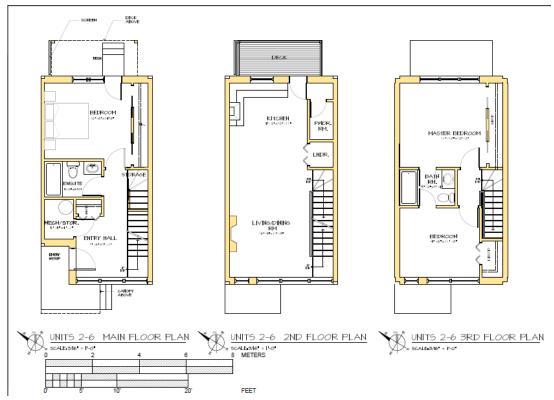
Typical floor plans Units 2-6. Source: Hamel Design April 24 2019 Rev. 17.
